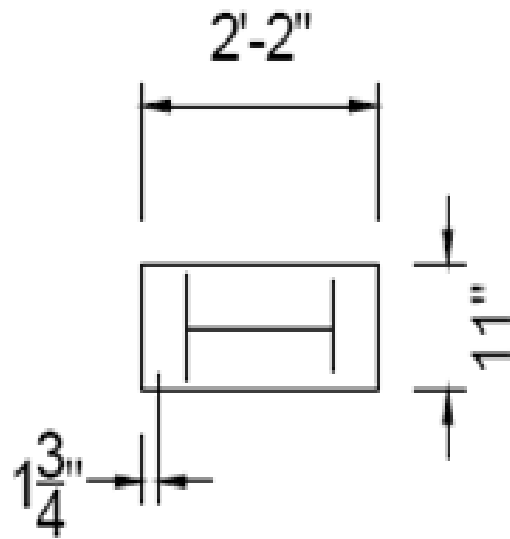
33 1/2" tall pedestal with dimensions of the top plate [1]
